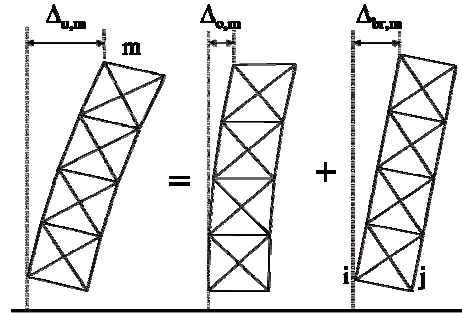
KINEMATICS OF CONTROLLED ROCKING TRUSS PIER
